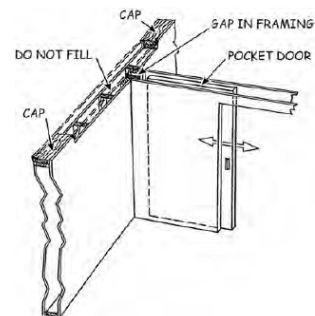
WALL CAVITY CONNECTING WITH POCKET DOOR CAVITY
